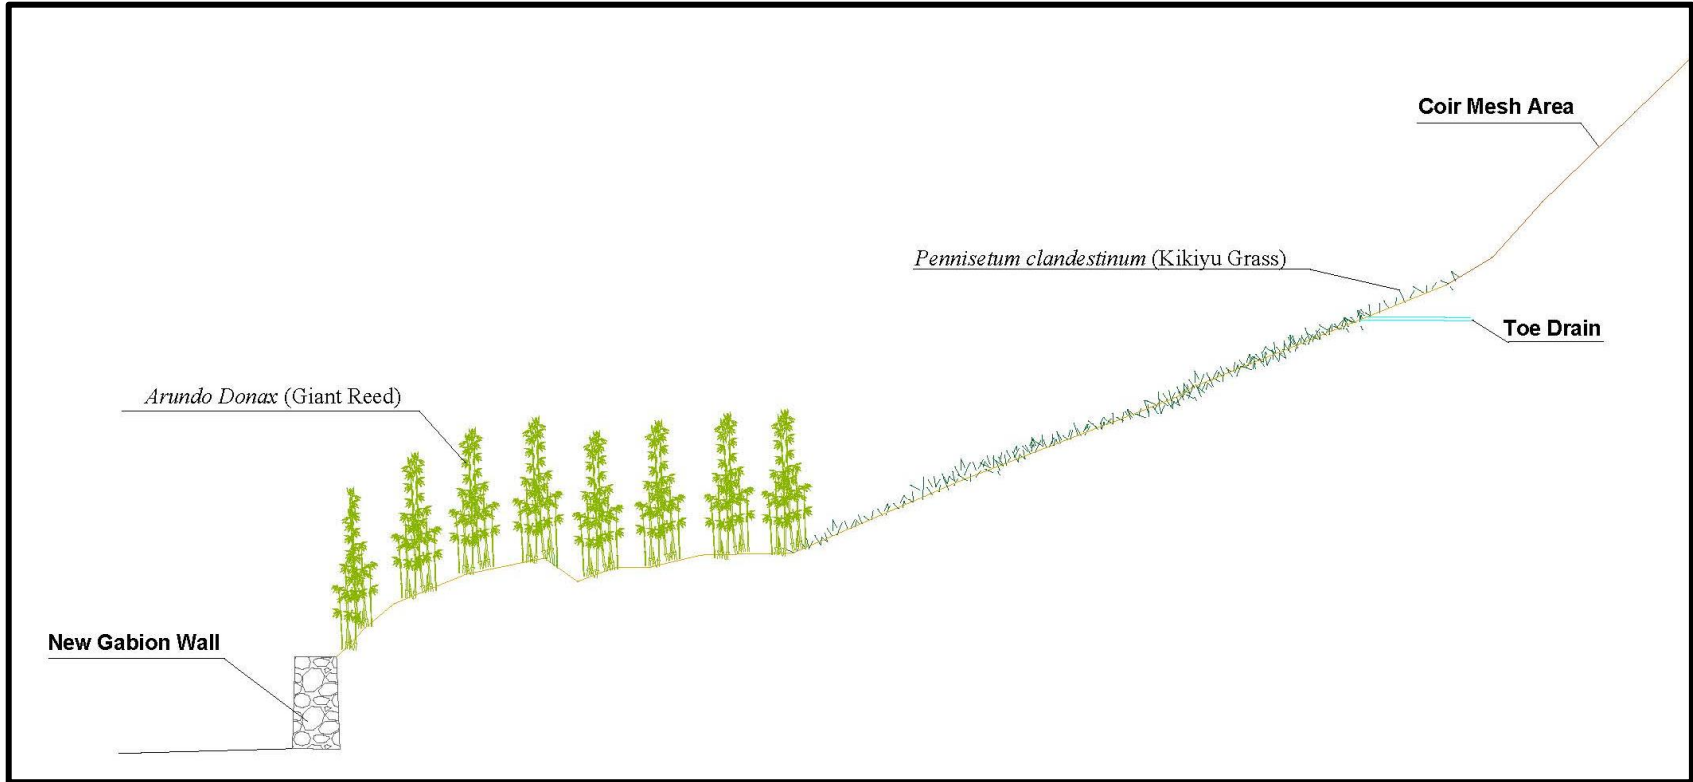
Side Elevation view of section between culvert 75-7 and 75-8
